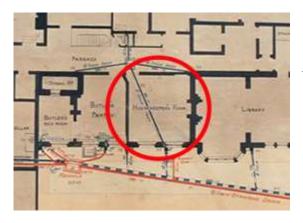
1886 Architects Plan, with 'Housekeepers Room' (G7 / G8) circled.
